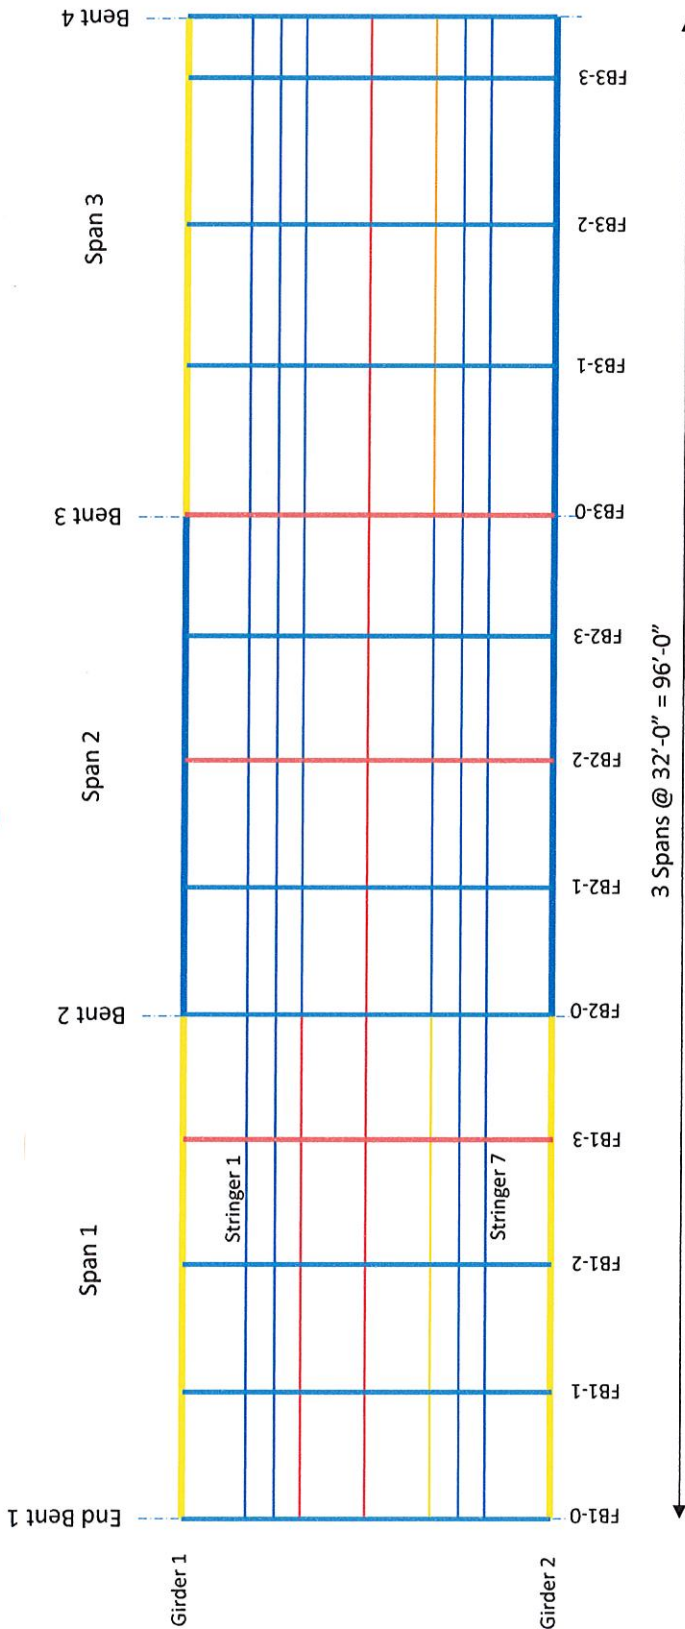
Plan View of Bridge 2490003 (Smyrna Road Bridge)
